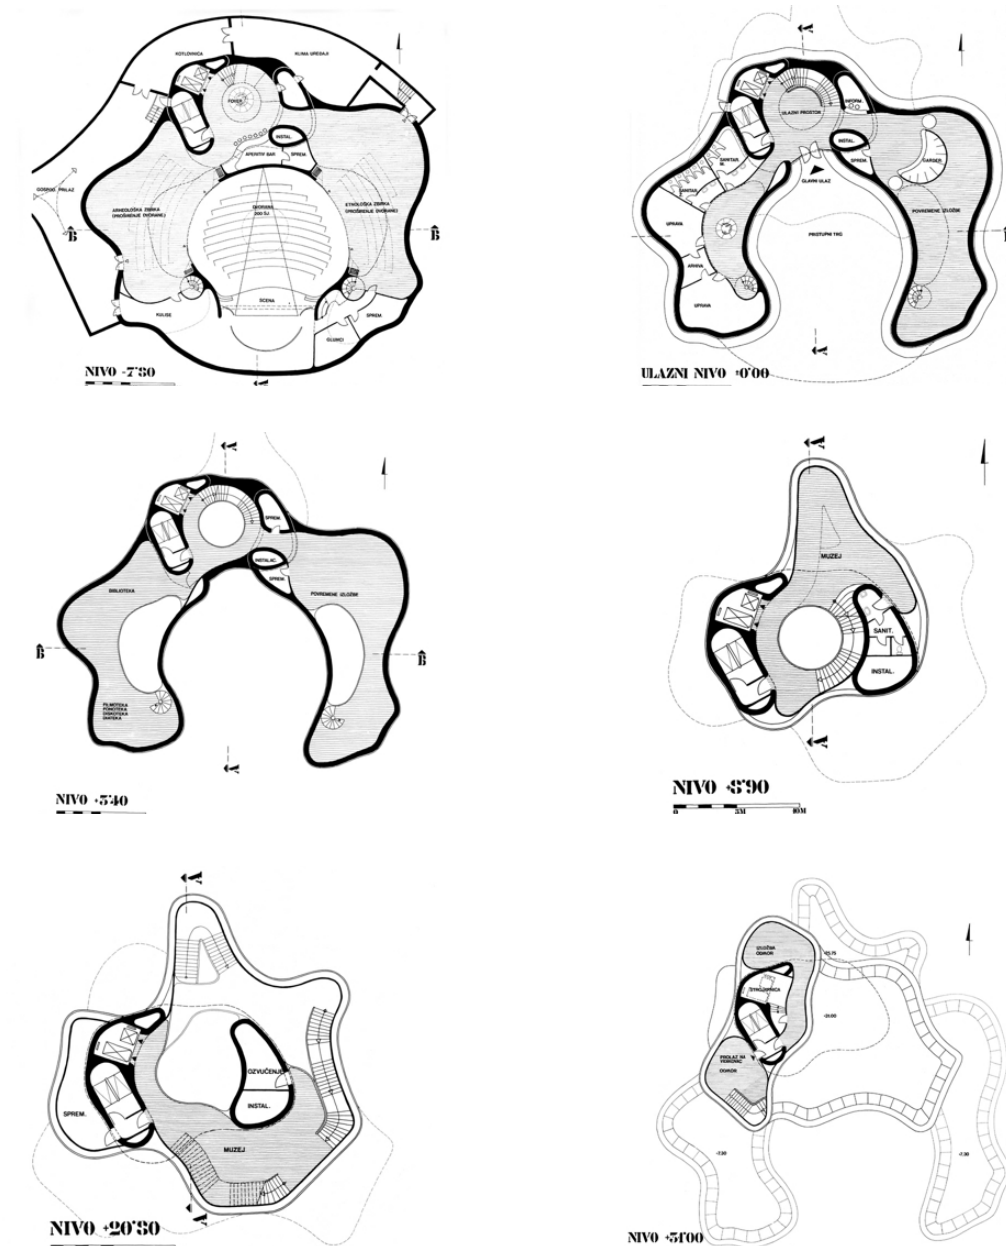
Archived floor plans of the six levels, from the entering ground floor, to the final roof-floor, the observatory
